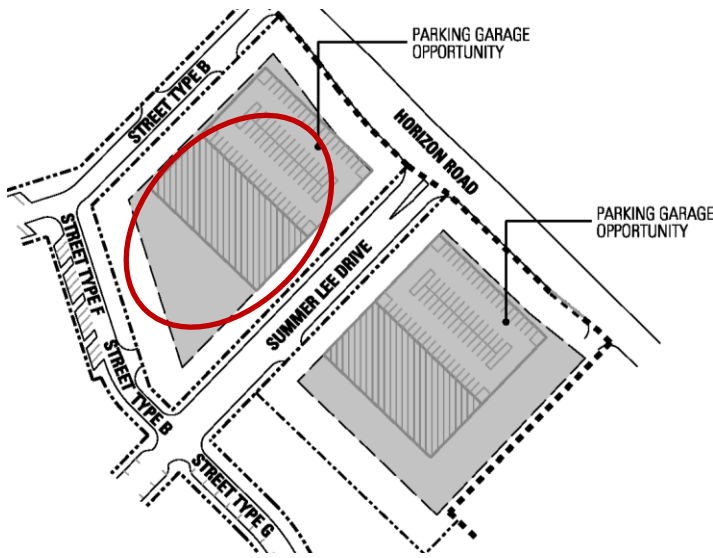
HORIZON/SUMMER LEE SUBDISTRICT CONCEPT PLAN CONTAINED IN ORDINANCE NO. 10-22
